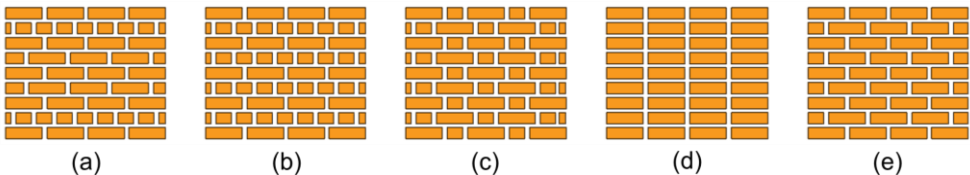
Possible arrangements for brick masonry: (a) American (or common) bond, (b) English (or cross) bond, (c) Flemish bond, (d) stack bond, (e) stretcher bond (adapted from Lourenço, 1998).
